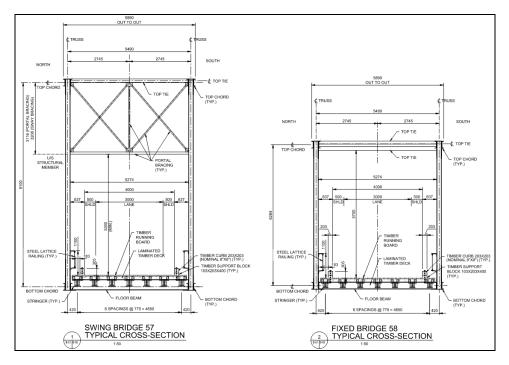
New Hamlet Swing and Fixed Bridges Sections
